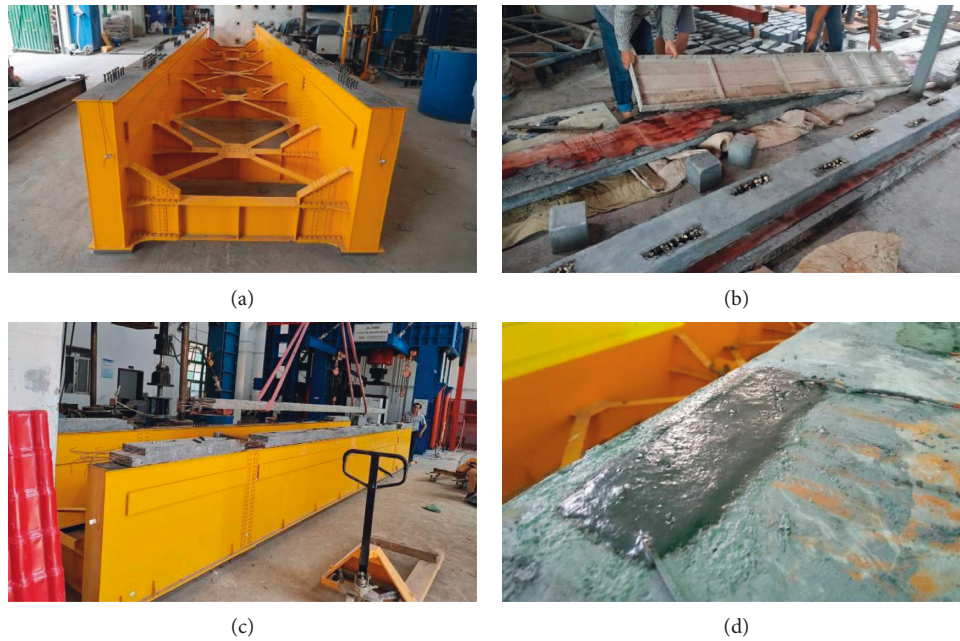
Prefabrication and assembly of the test beam in the laboratory. (a) Prefabricated steel beam. (b) Prefabricated concrete slab. (c) Hoisting of prefabricated concrete slab. (d) Pouring of reserved notches.
